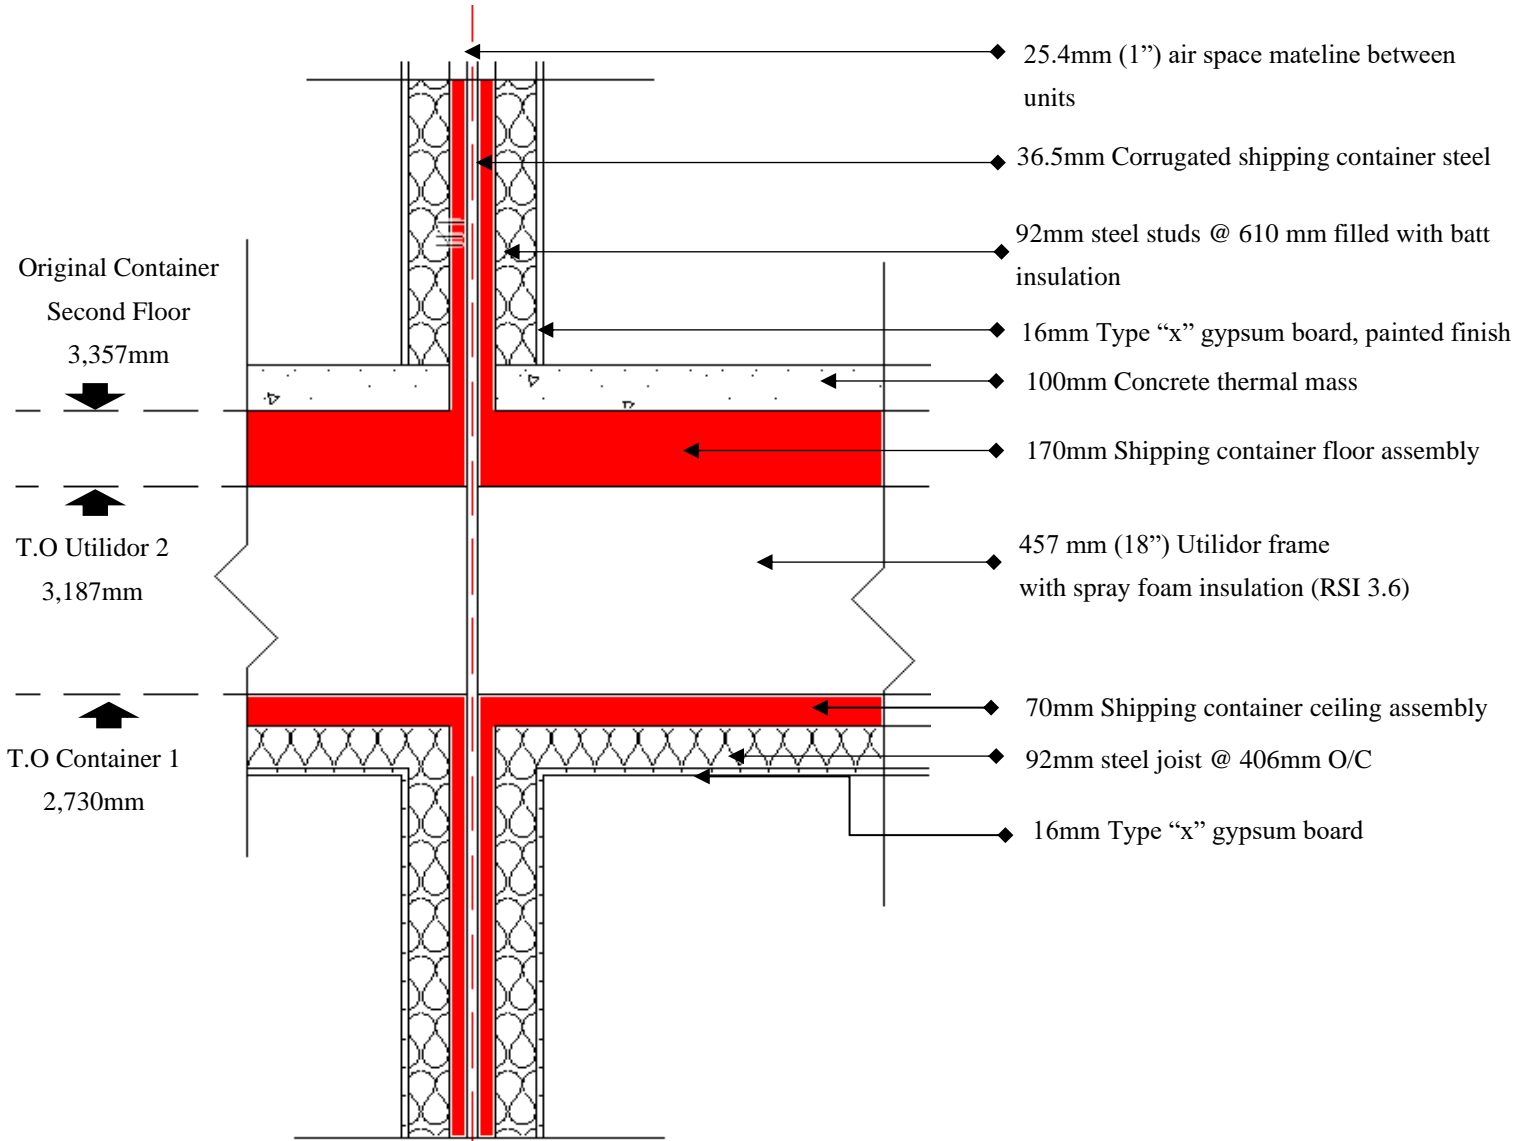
Container Building Floor to Floor Connections and Mateline
